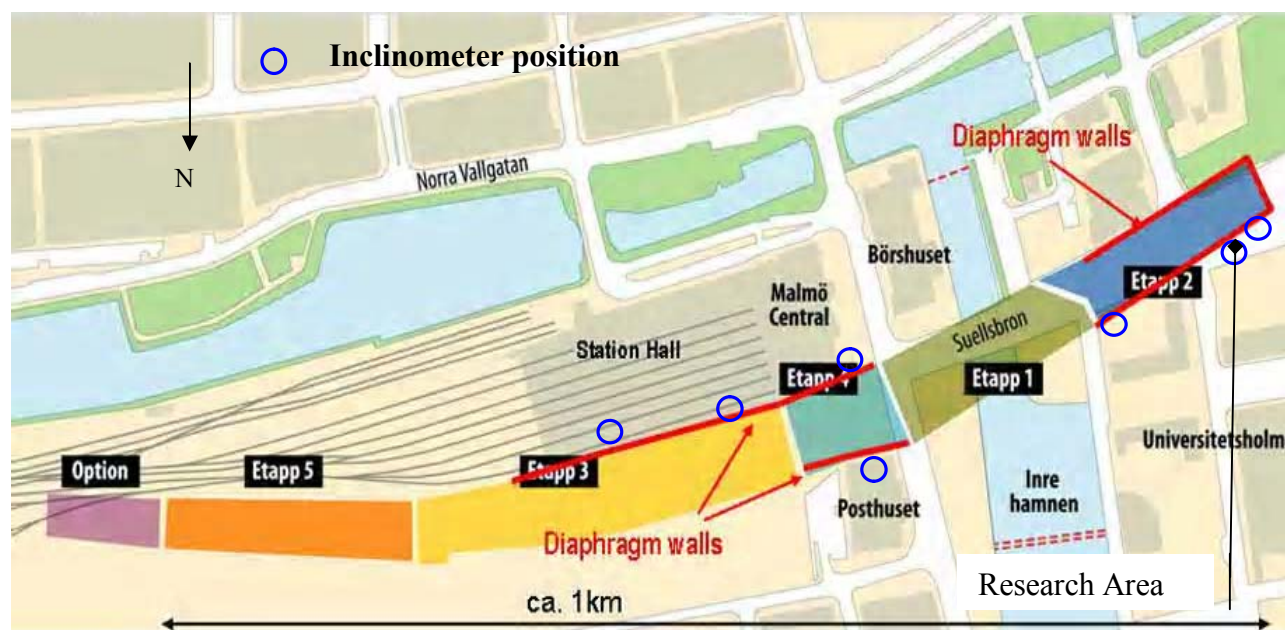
Areas of diaphragm walls and position of inclinometers at the Citytunnel project
